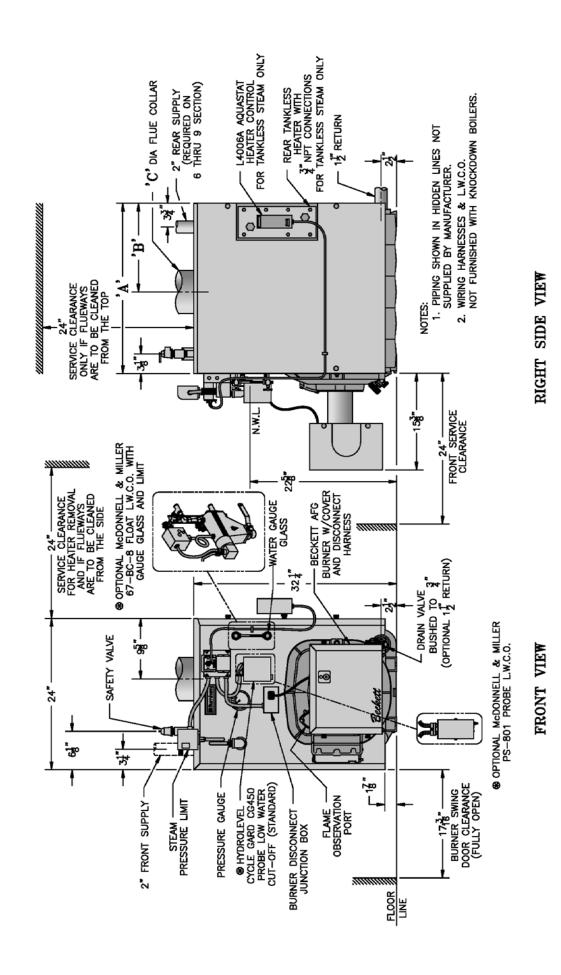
D: V83 thru V89 Steam Boiler with or without Tankless Heater
